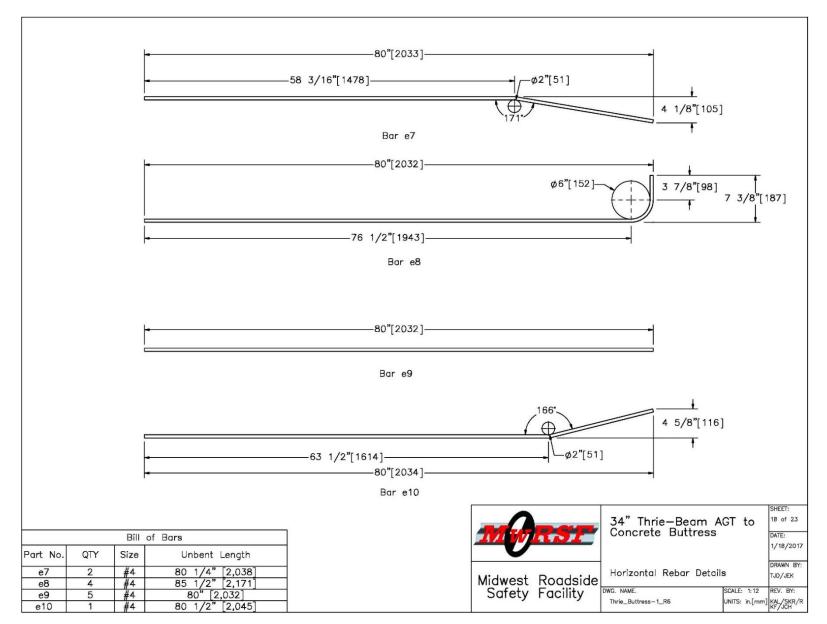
Horizontal Rebar Details, Test Nos. 34AGT-1 and 34AGT-2
